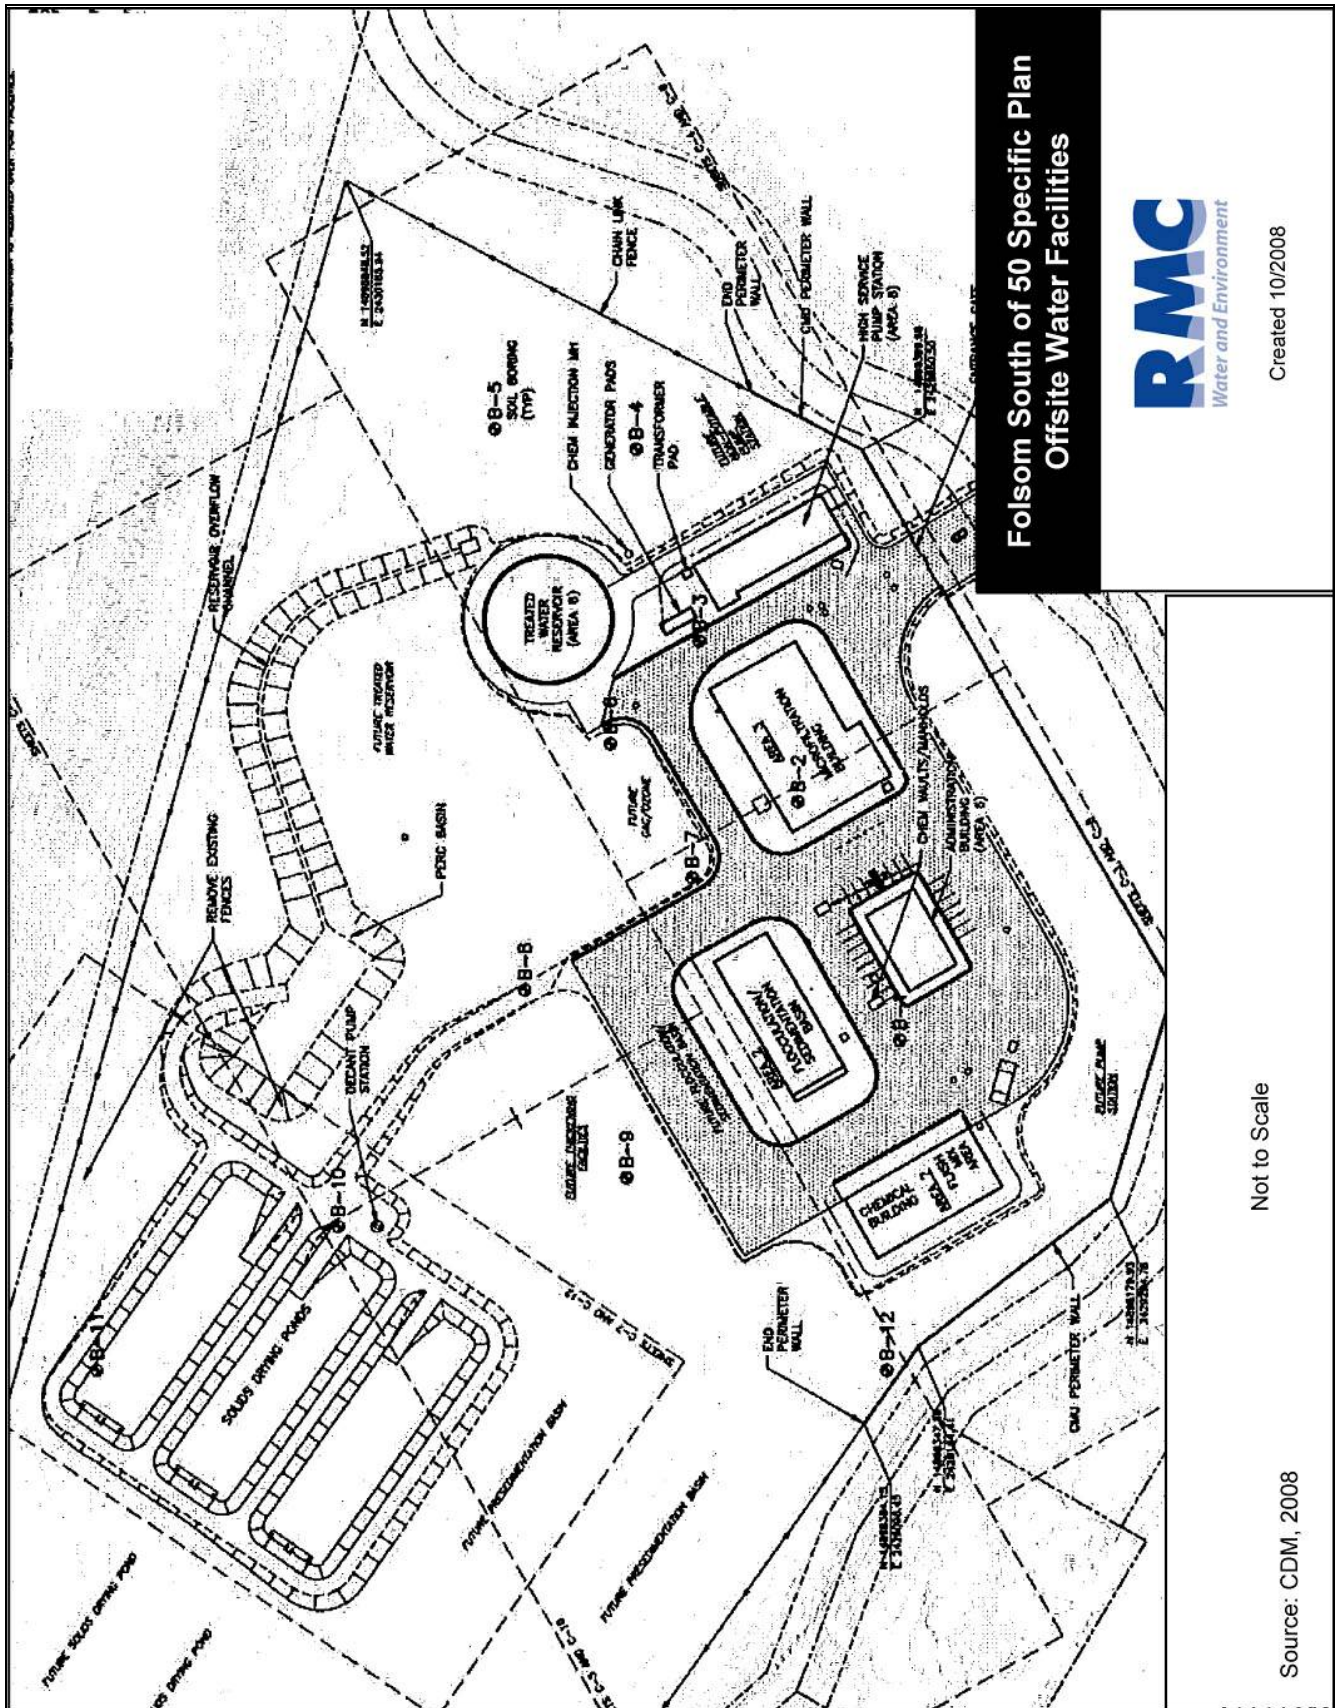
shows a conceptual layout of the On-site WTP facility, including anticipated major physical features. The WTP facilities would be constructed of concrete and the exterior painted. The grit basins, flow split, flocculation and sedimentation basins, filters, equalization basins, and backwash clarification would be open-water areas. Membrane filtration may be considered as an alternative to the conventional treatment process. The administration/operations building, maintenance building, chemical building, electrical building, and treated water pump station(s) would be enclosed structures, constructed of concrete masonry units or steel. Buildings would be faced with materials such as stucco or split-face block. Steel structures would be painted to blend with the existing environment.
